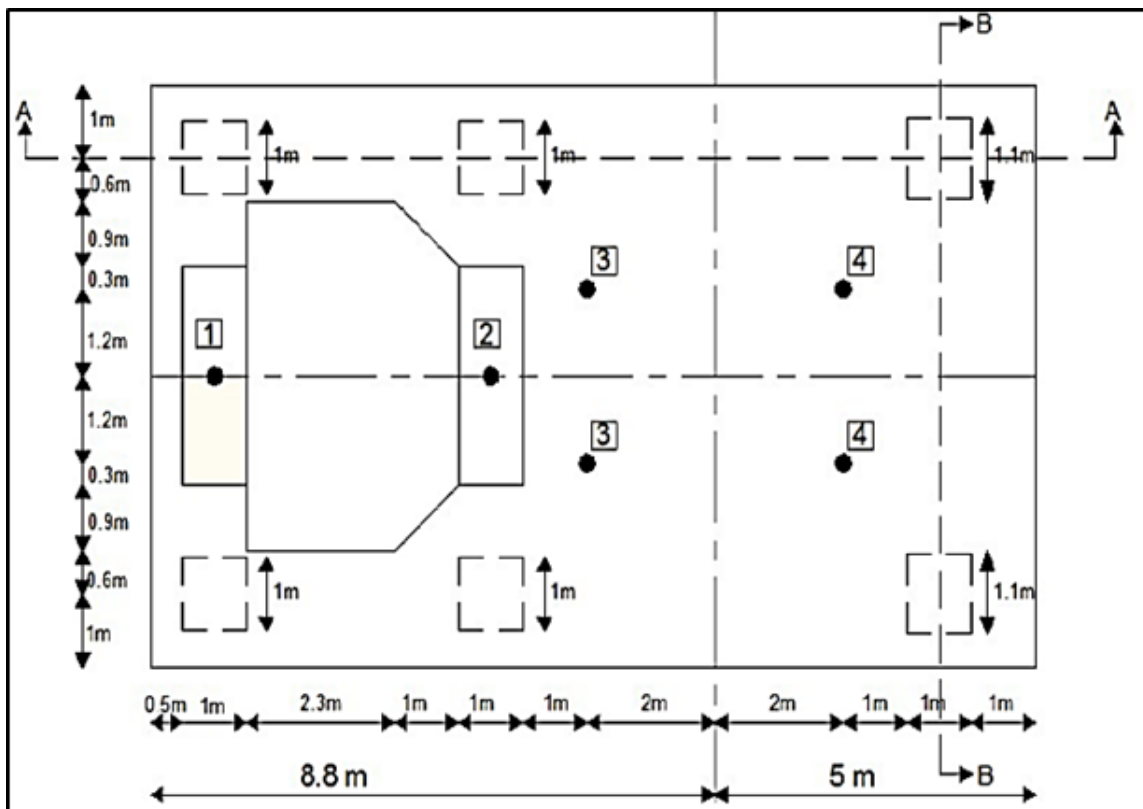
Bearing locations and table-top dimensions of frame foundation [2]
